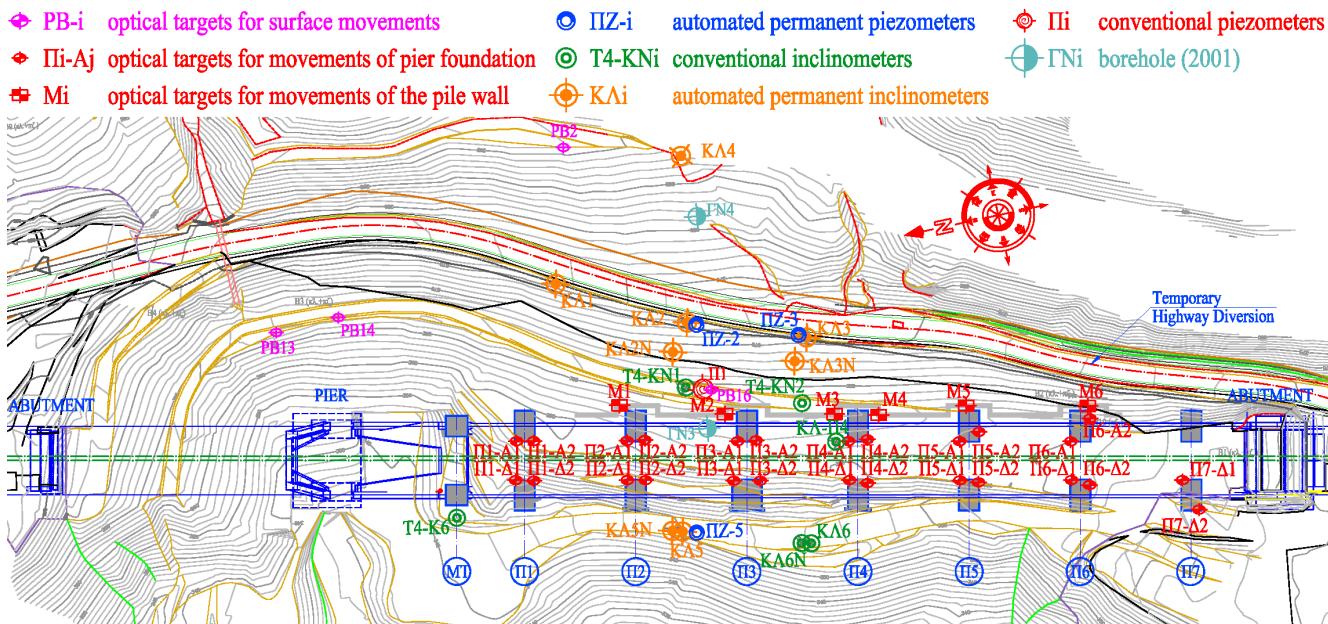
Arrangement of the geotechnical instruments in plan-view.
